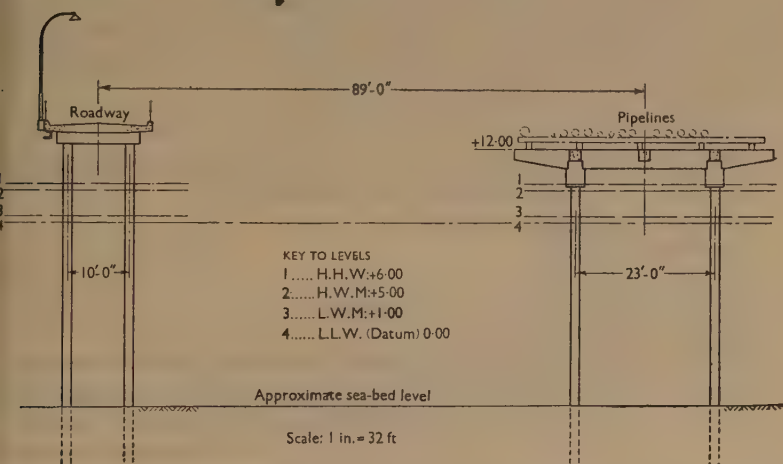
CROSS-SECTION THROUGH ROAD NECK
